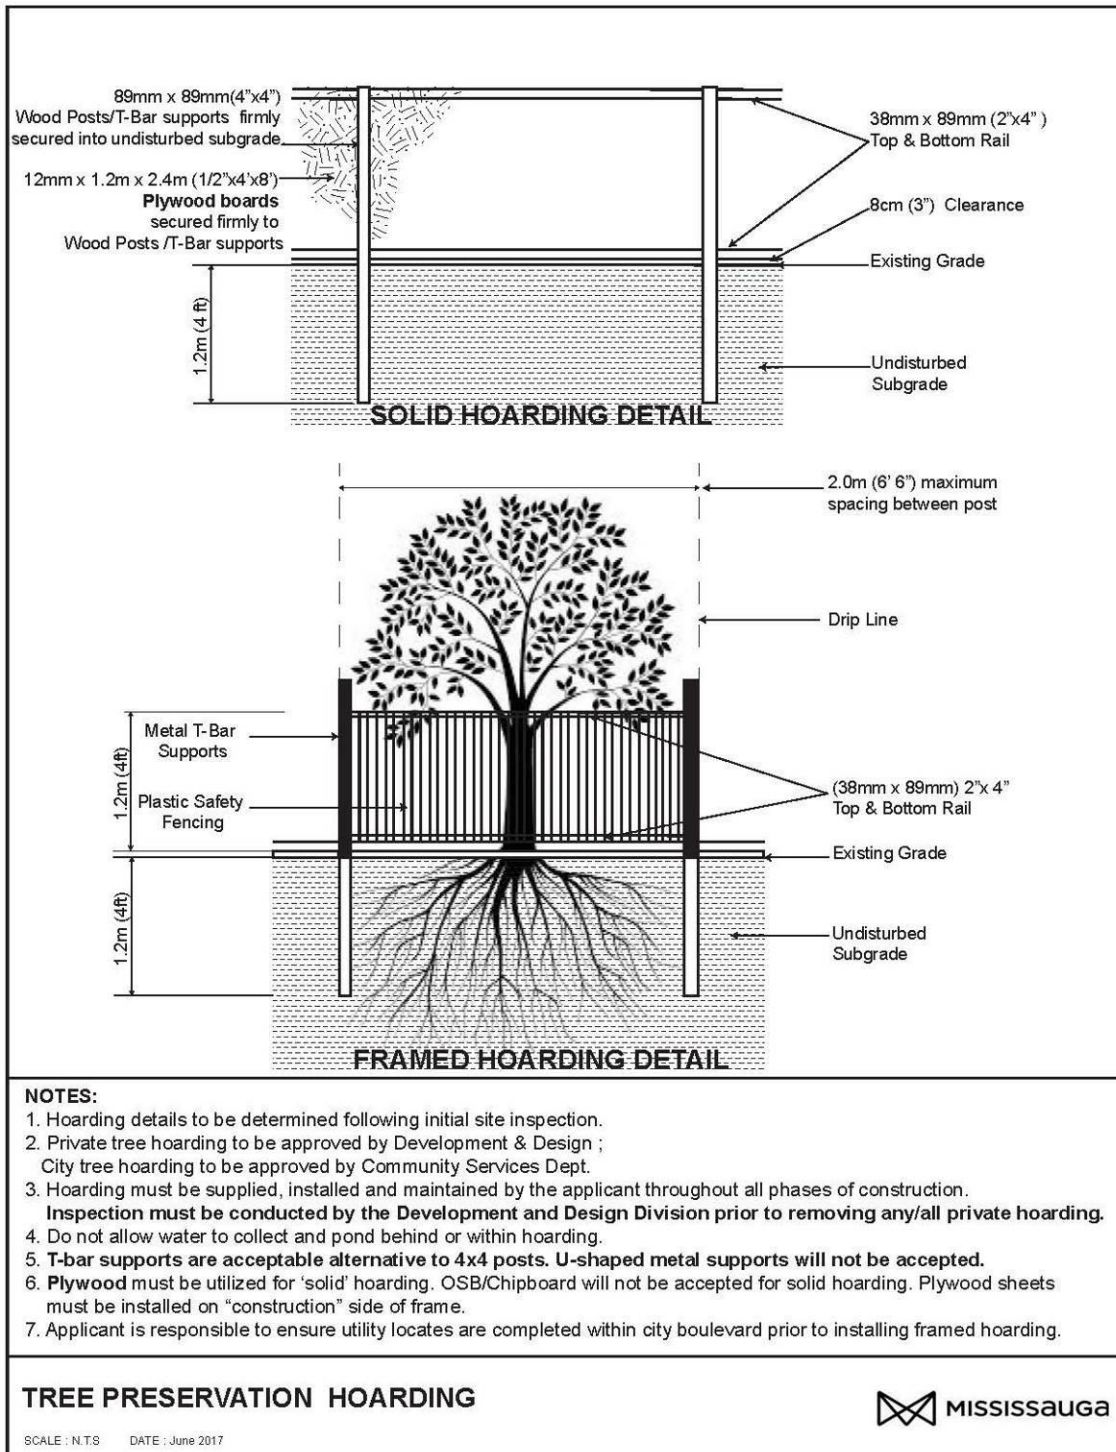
Mississauga Tree Protection Hoarding – Solid and Framed
